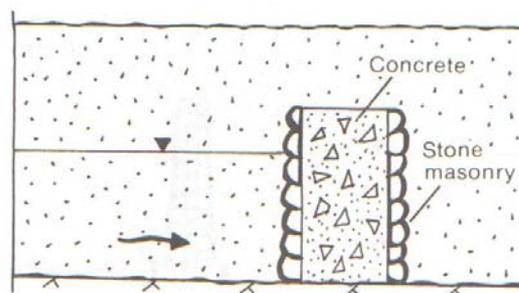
Stone masonry dam (Nilsson, 1988)
